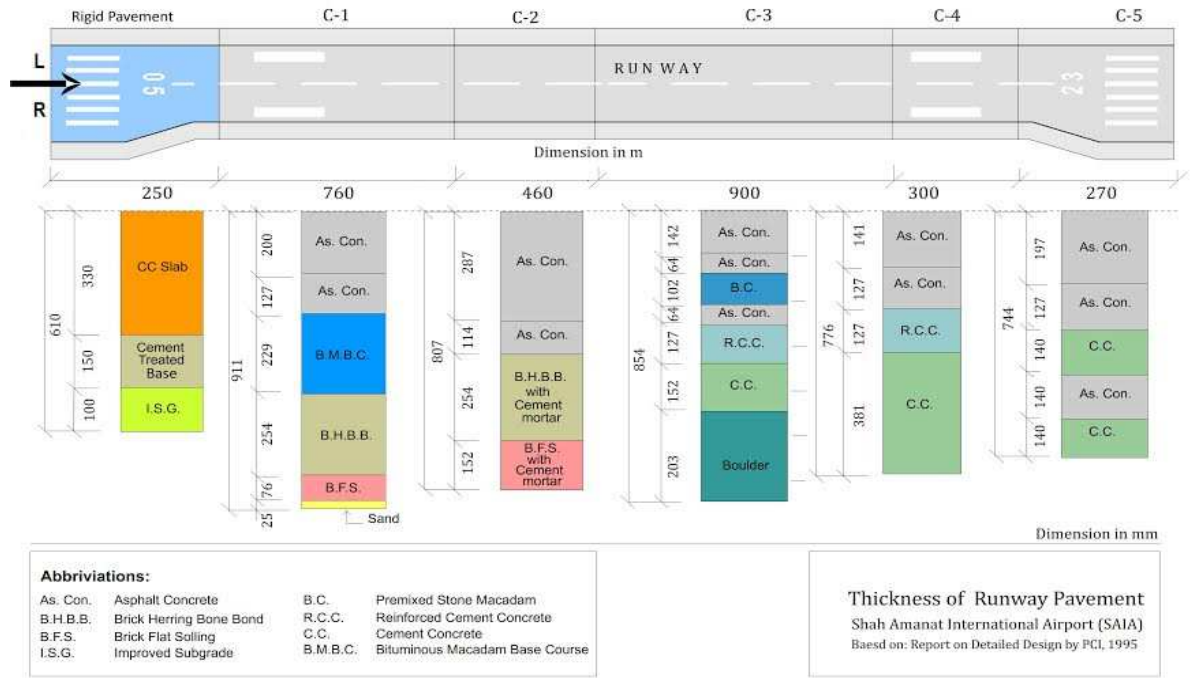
Existing Layers of SAIA Runway Pavement at Different Sections
